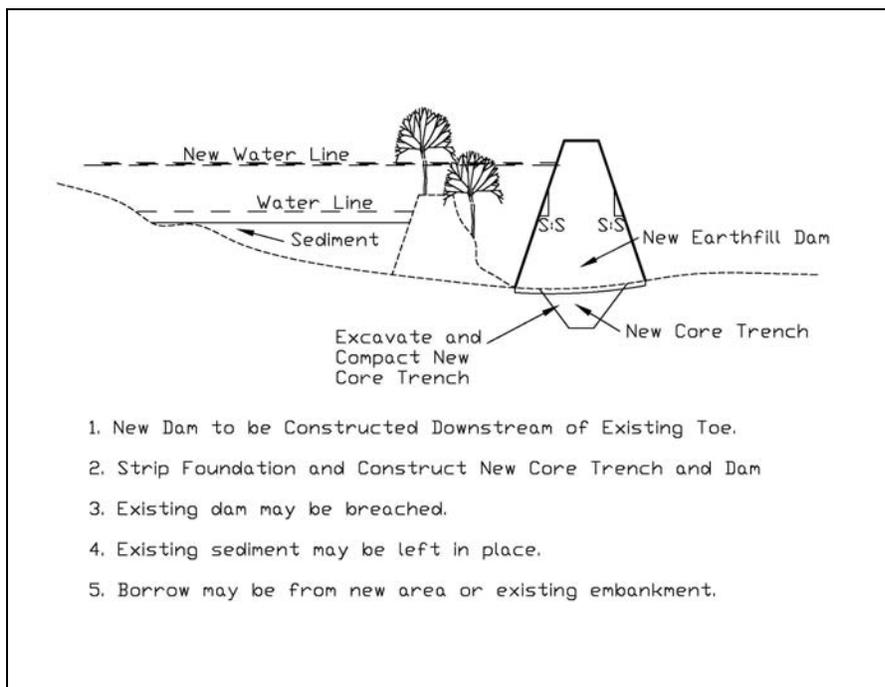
Drawing of a typical method to construct a new dam downstream of an existing dam.
